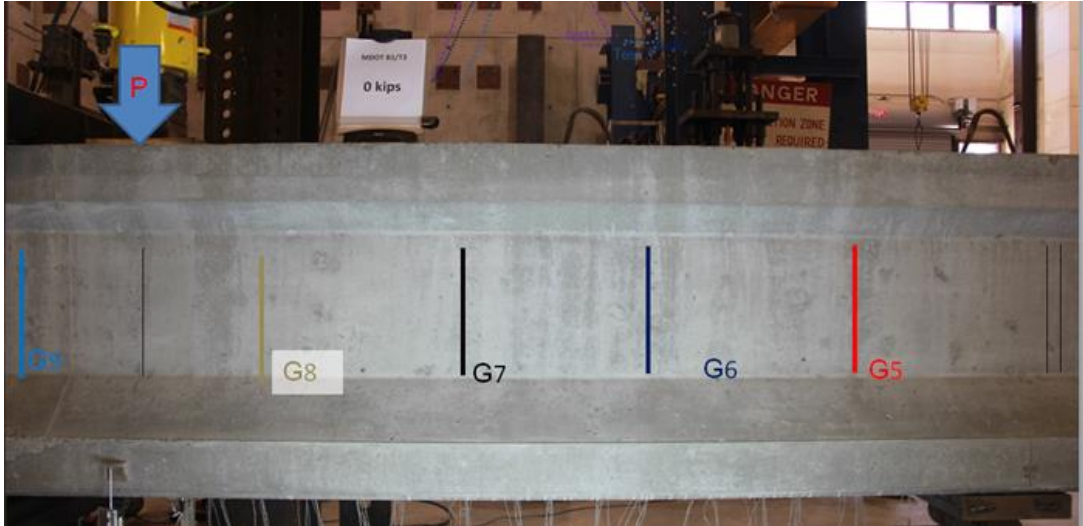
Girder 1- Test 3 stirrups strain gauges locations
